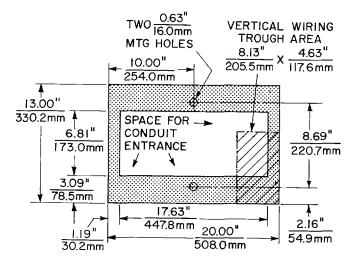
Bottom conduit entrance space 13-in. (330.2 mm) deep section
